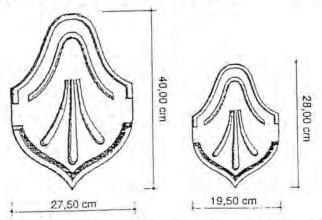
Beavertail-shaped roof tiles from the Rupel region of Belgium.
